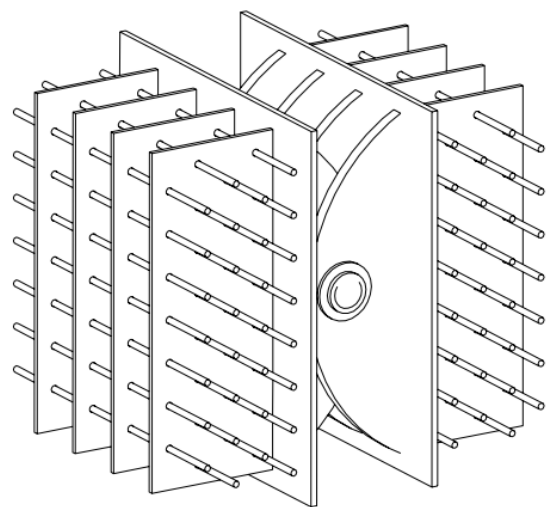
Detail showing the hinge used for connection the two halves of the arch together. The steel dowels are shown in the figure.
